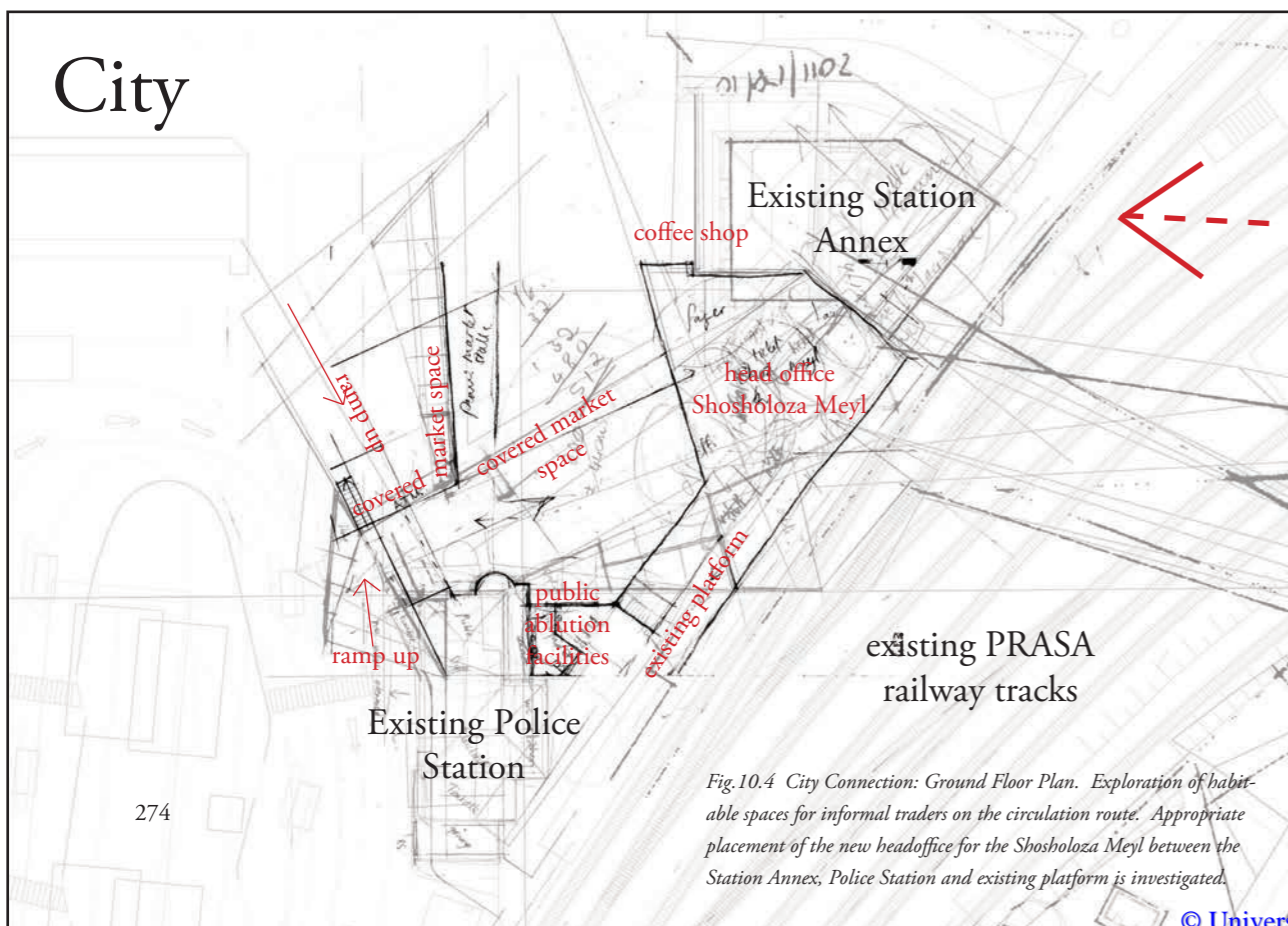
City Connection: Ground Floor Plan. Exploration of habitable spaces for informal traders on the circulation route. Appropriate placement of the new headoffice for the Shosholozza Meyl between the Station Annex, Police Station and existing platform is investigated.
